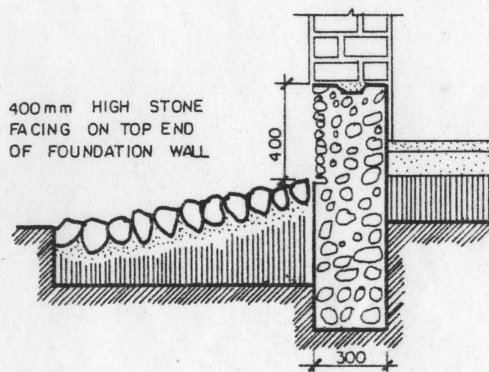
Concrete strip foundation, with apron under eaves overhang of stone set in soil/sand/bitumen to falls, suitable for heavy rainfall areas (after ref 11)
